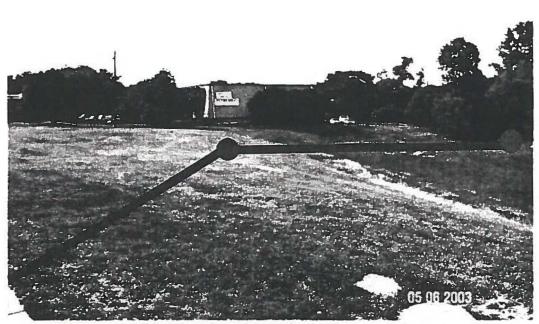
Quail Creek Park - From Rutland looking towards apartments
